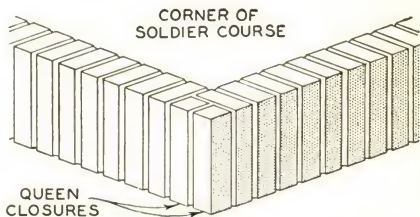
Corner of Brick Veneer Soldier Course Showing Method of Placing Brick
